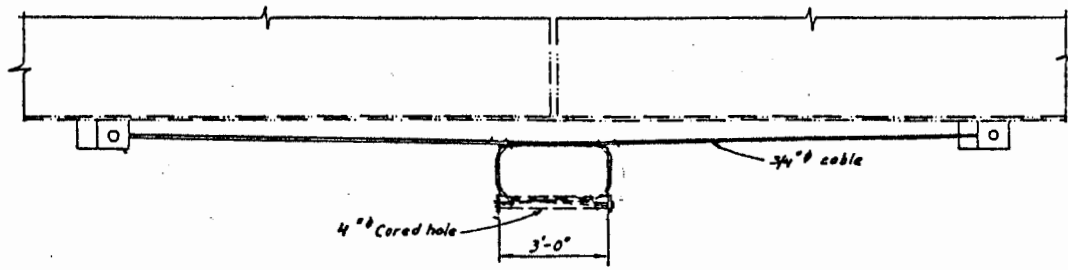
Elevation View of Longitudinal Cable Restrainer.
